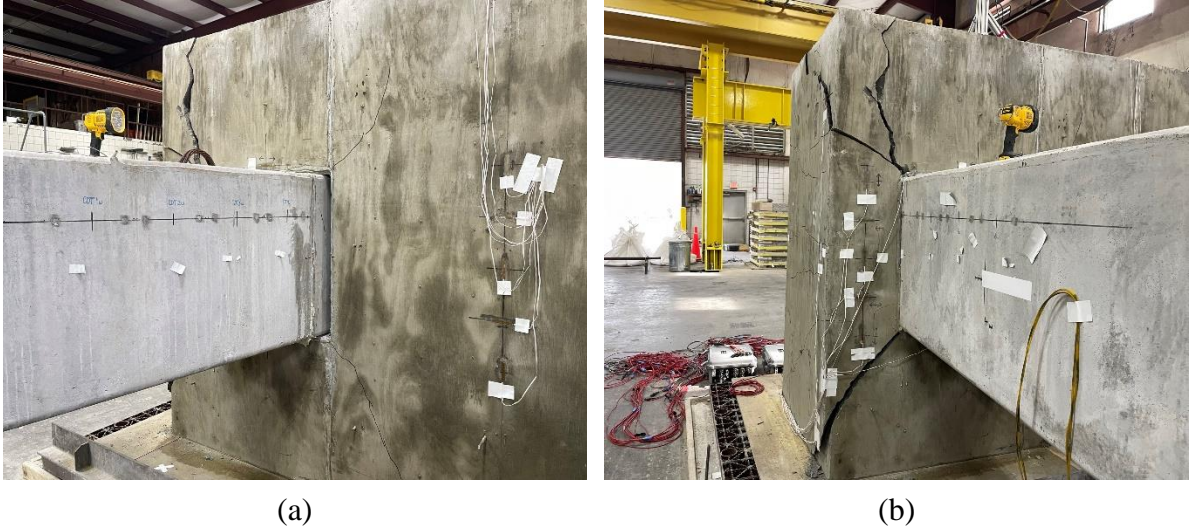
SP-10 failure (a) pile slipping out of pile cap, (b) punching shear failure
